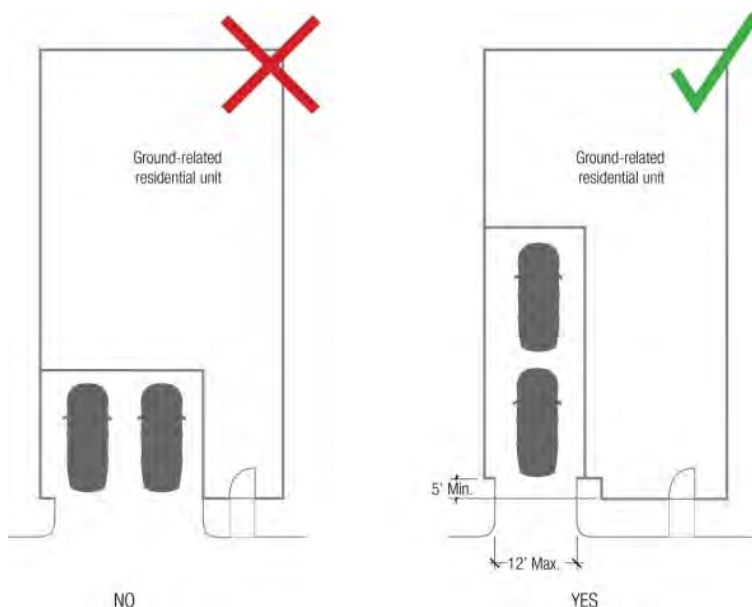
B.3: Driveways serving ground-related residential units must be no more than 12 feet wide. Tandem parking is allowed. This diagram is for illustrative purposes only. See OMC 18.120.240 for applicable requirements.
